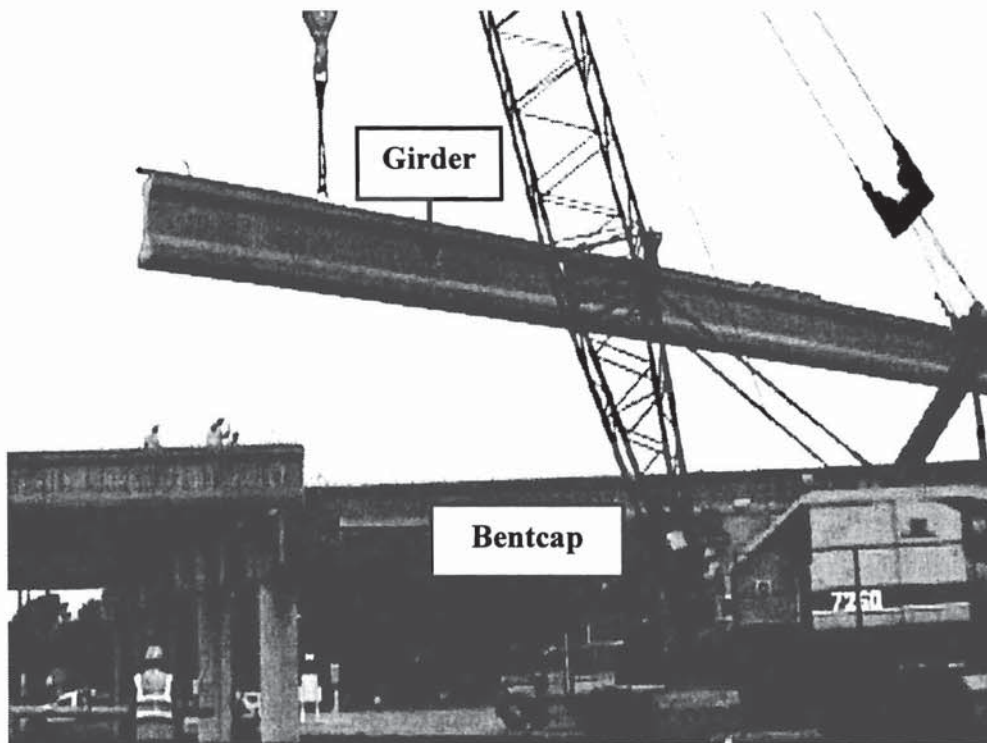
Placing Girders at Krenek Road Bridge Site
